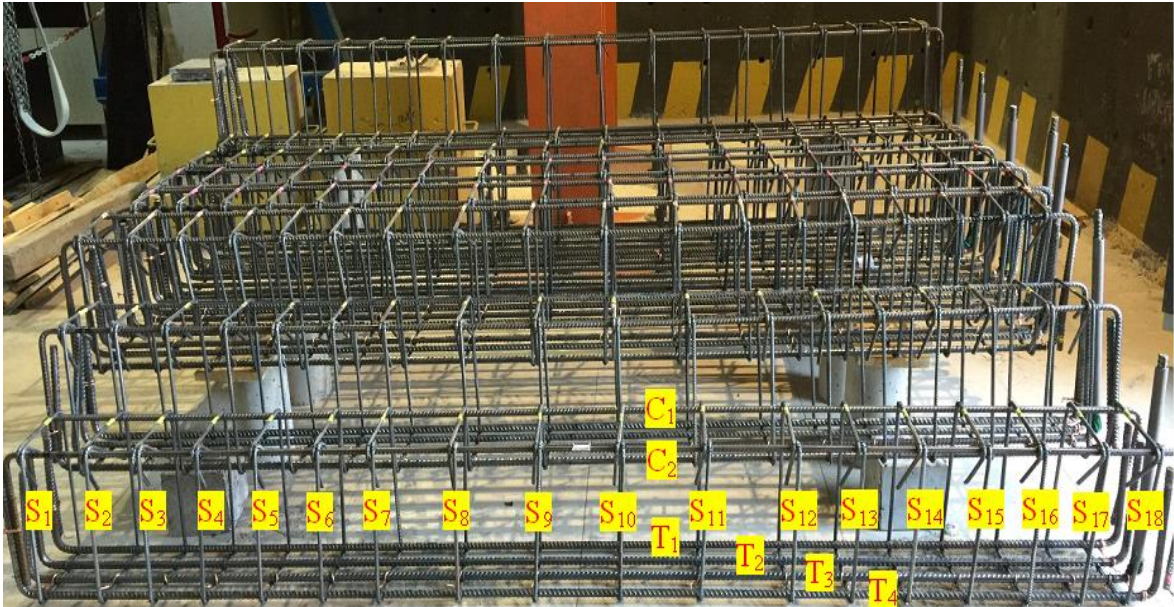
6: Prepared reinforced concrete beams before concrete casting.
